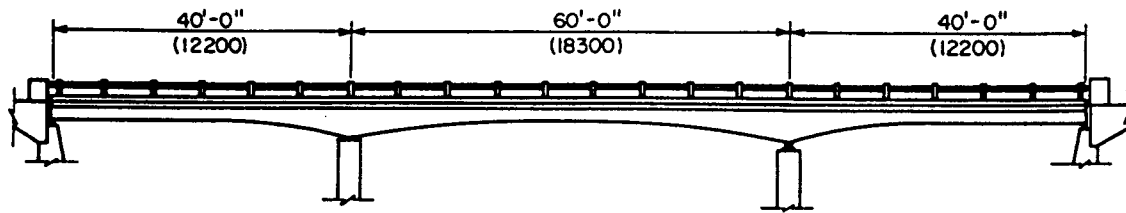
Reinforced Concrete Bridge Details (Mikhailovsky and Scanlon 1985)
